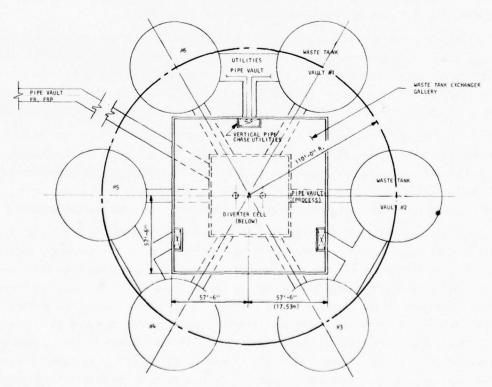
Top View of the Waste Tank Equipment Building and Storage Tank for High-Level Liquid Waste at the FRP
